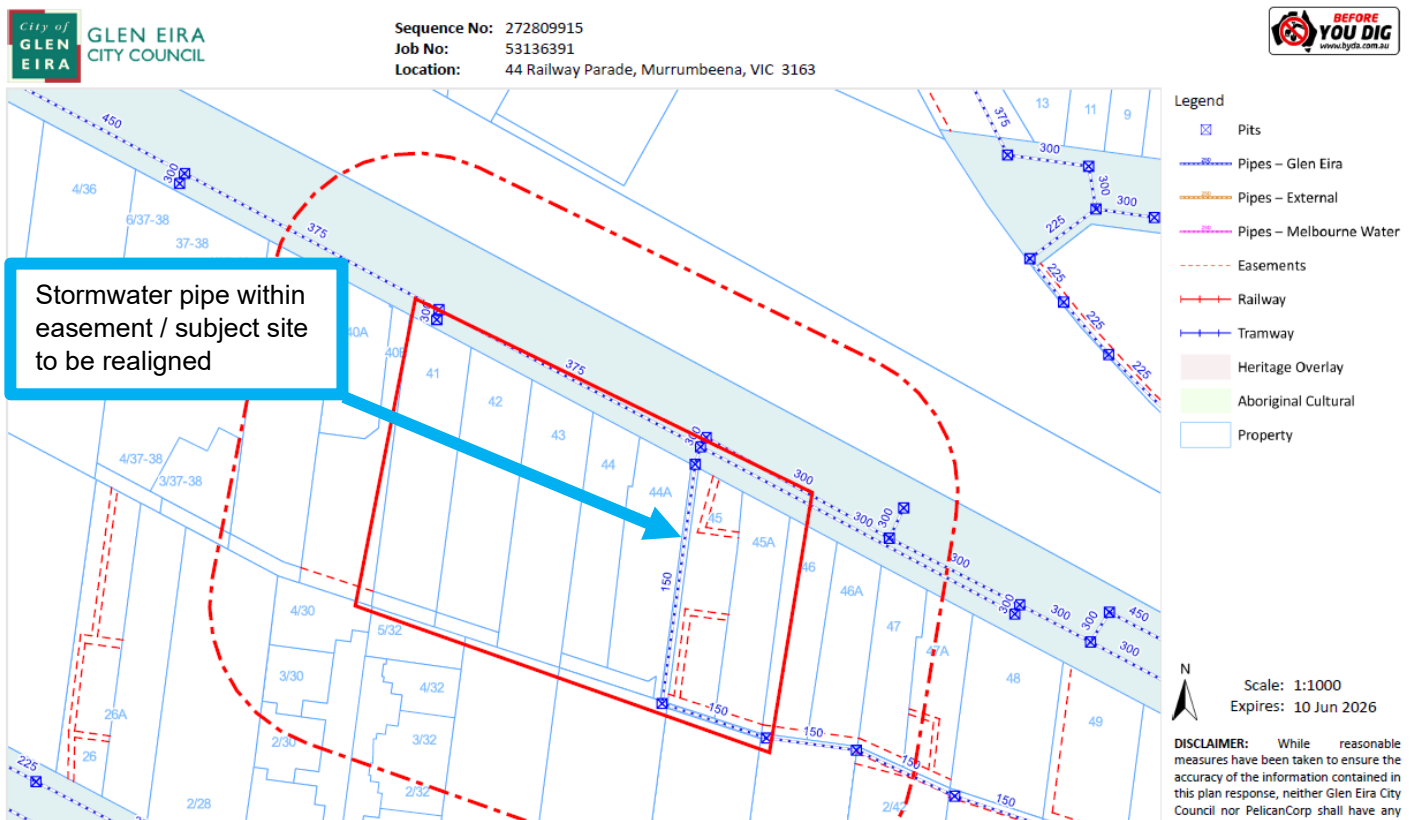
Extract of asset information showing the relevant stormwater pipe within the subject site.
